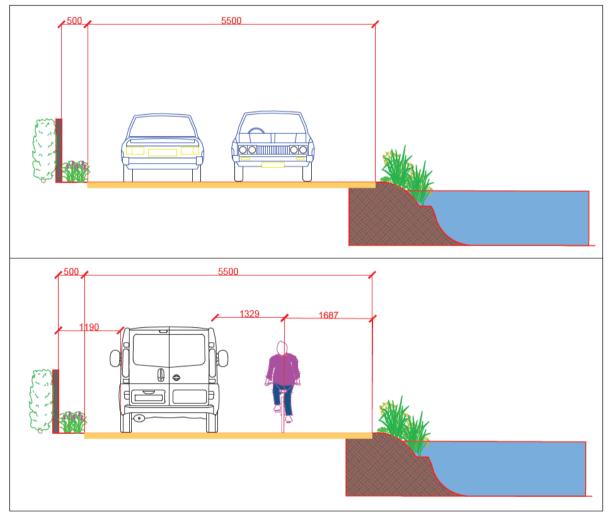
Indicative Sections of Proposed Greenway at Coke Oven Cottages
